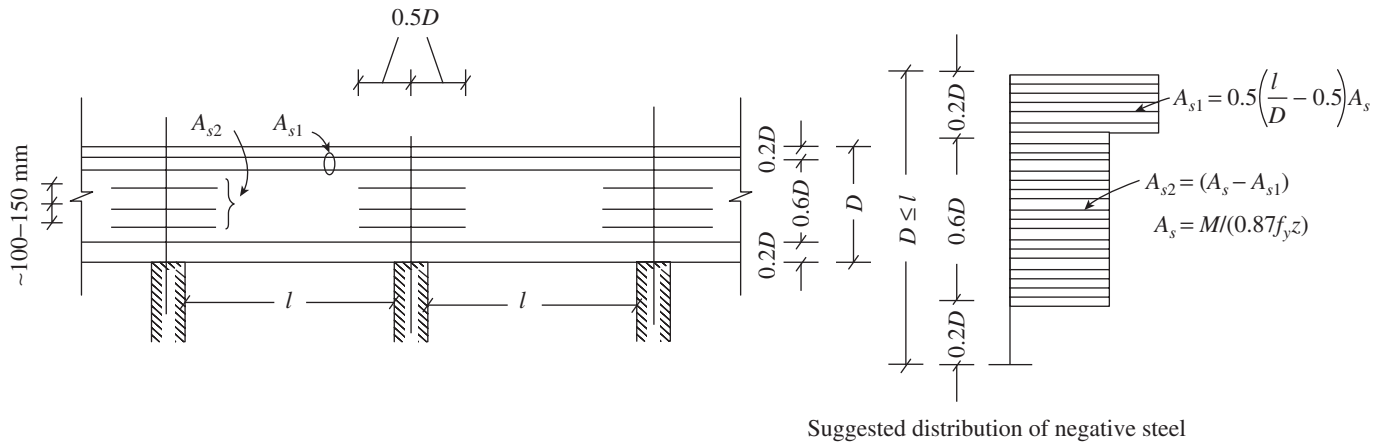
Detailing of negative reinforcement in continuous deep beams ($1.0 \leq l/D \leq 2.5$)
